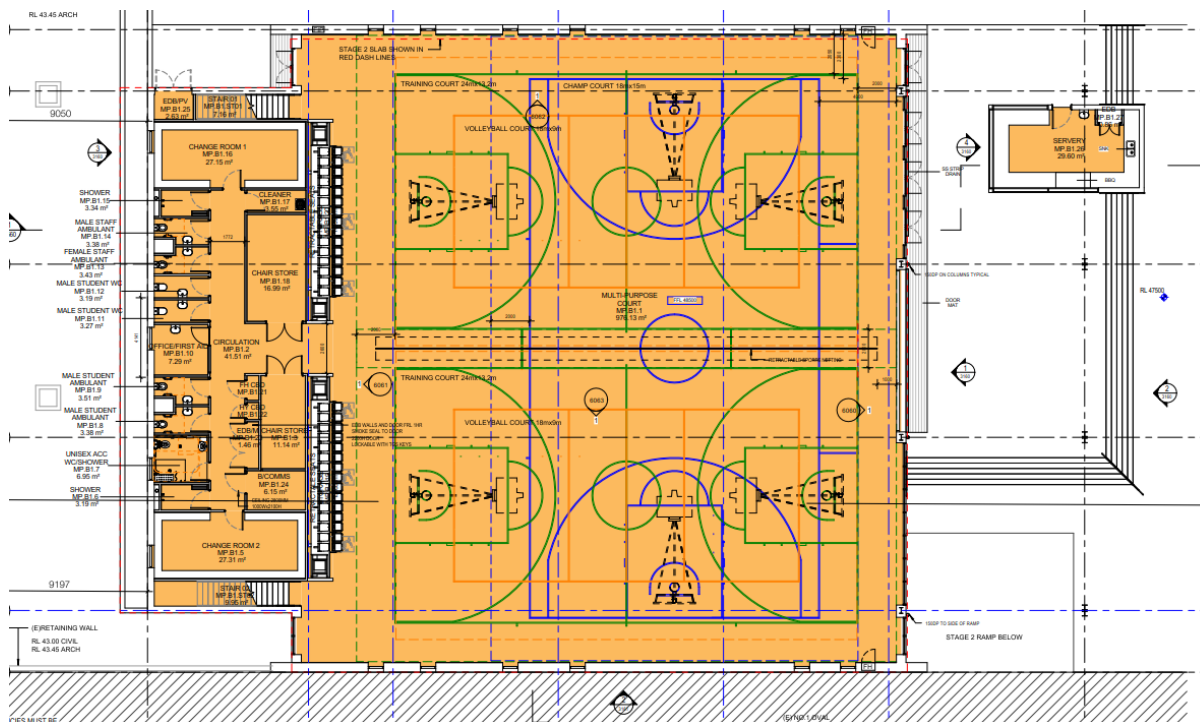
Plan of Multipurpose Pavilion Building (Level 0 - GF)
